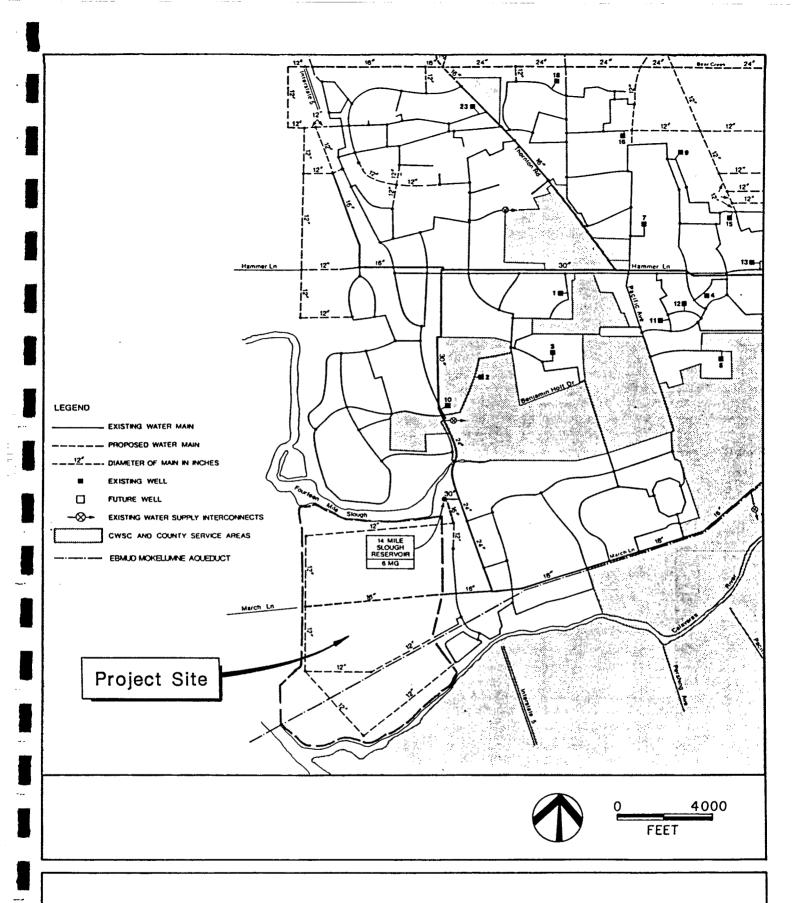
EXISTING AND PROPOSED WATER FACILITIES
